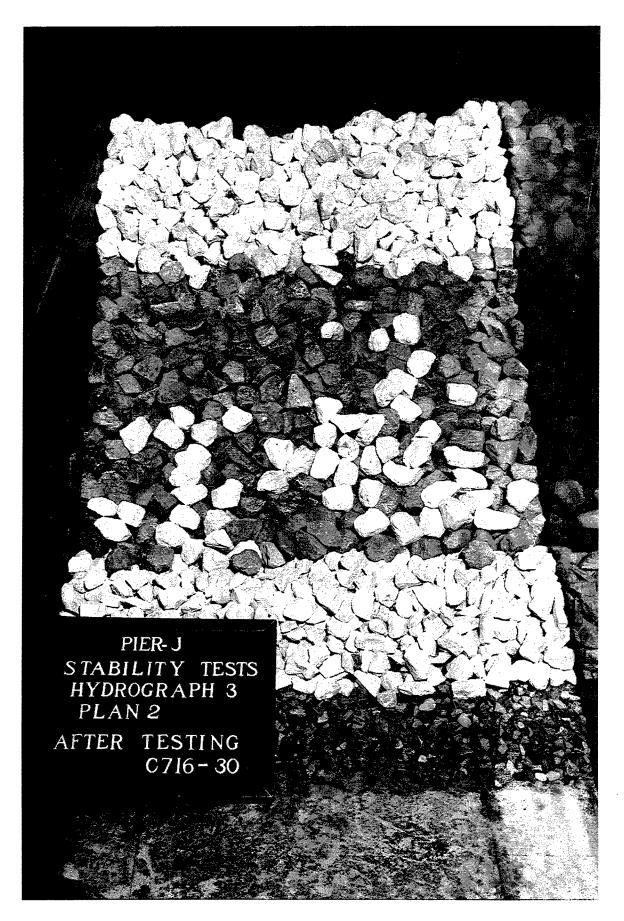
Sea-side view of Plan 2 at the conclusion of testing
